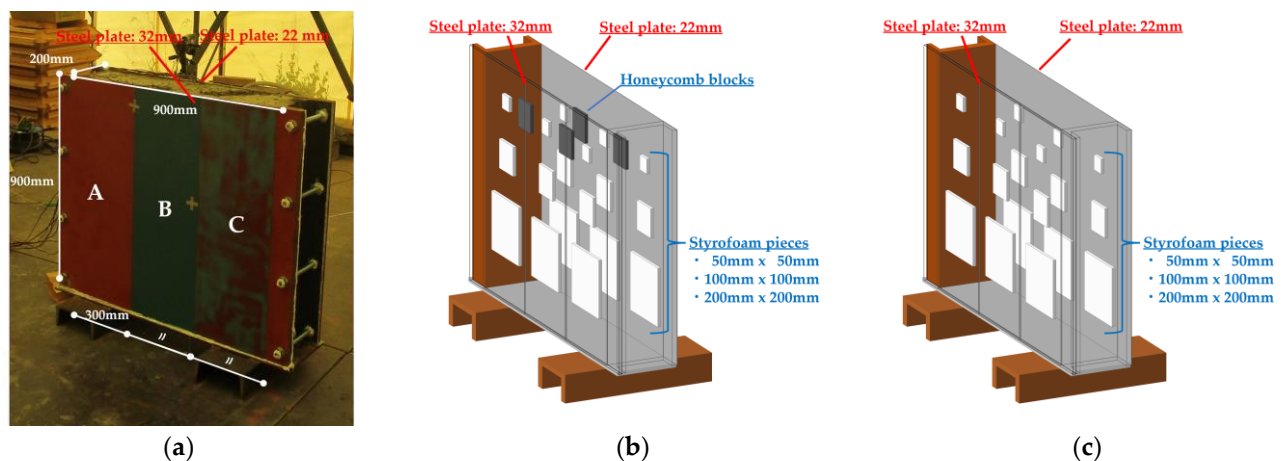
Test specimen overview. (a) Appearance of test specimen; (b) Test specimen 1; (c) Test specimen 2
